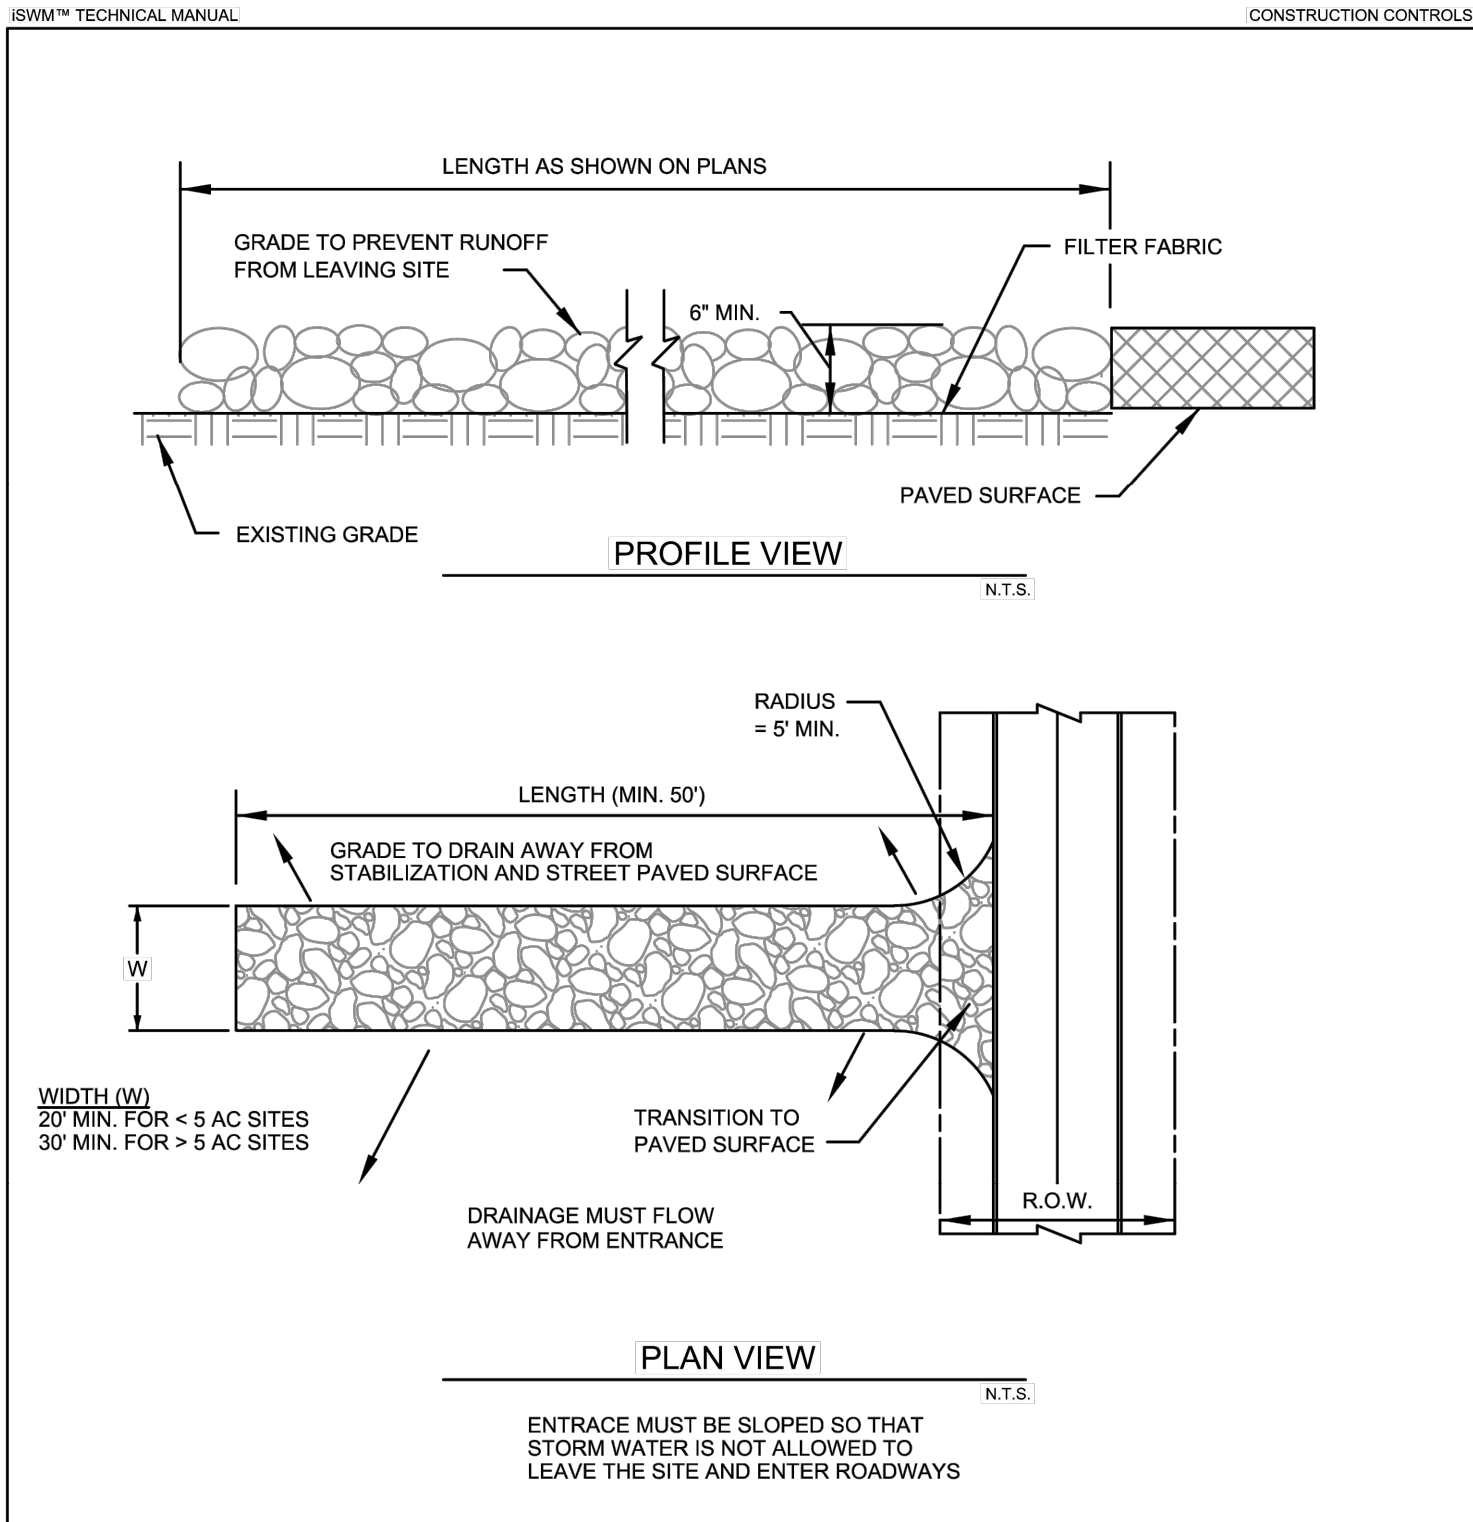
STANDARD CONSTRUCTION DETAIL - STABILIZED CONSTRUCTION EXIT (1 OF 2)
